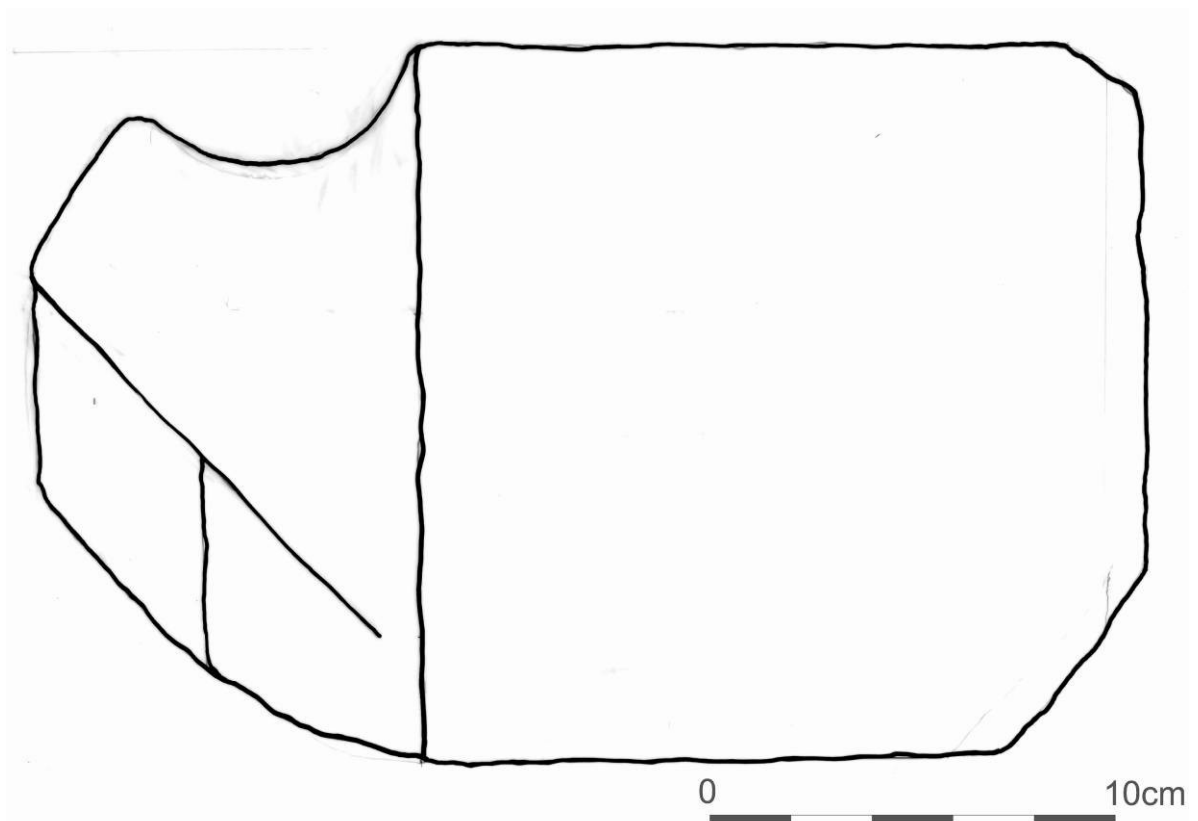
Section through part of a window hood mould dating to the 16th or 17th century reused in wall (107) in Trench 3
